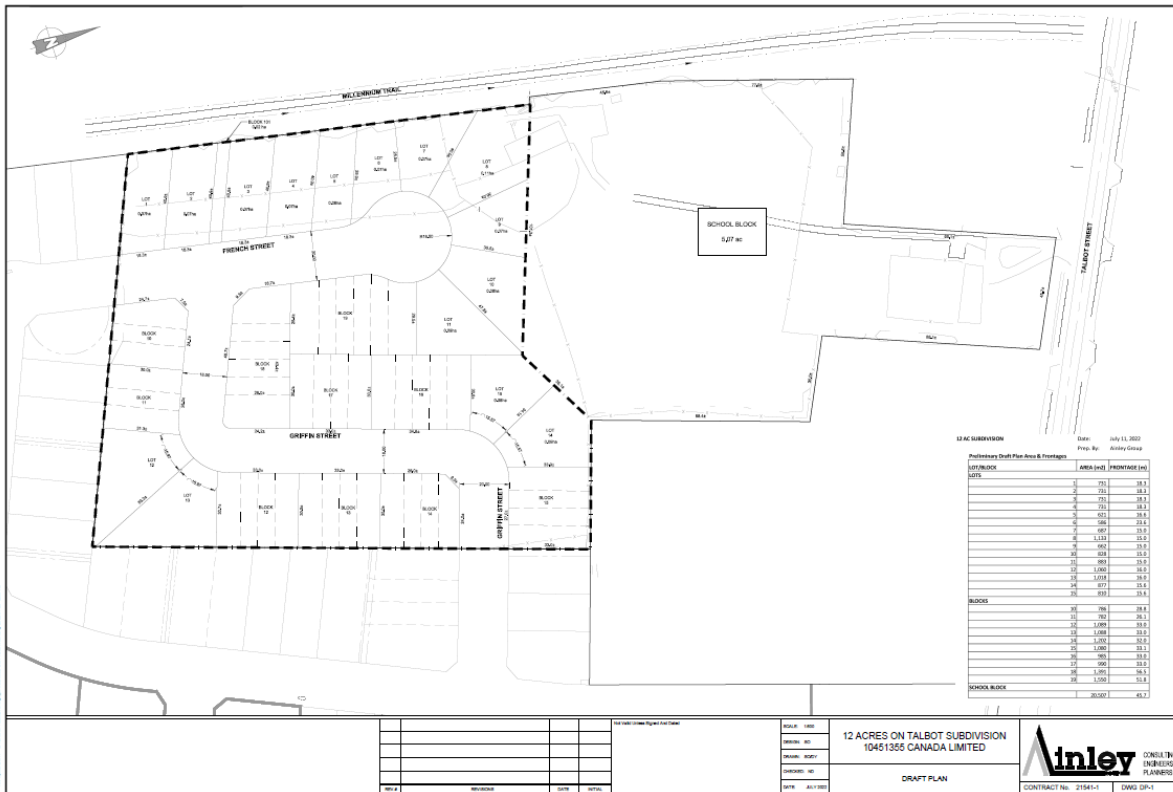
Draft Plan of Subdivision (Source: Ainley Group)
